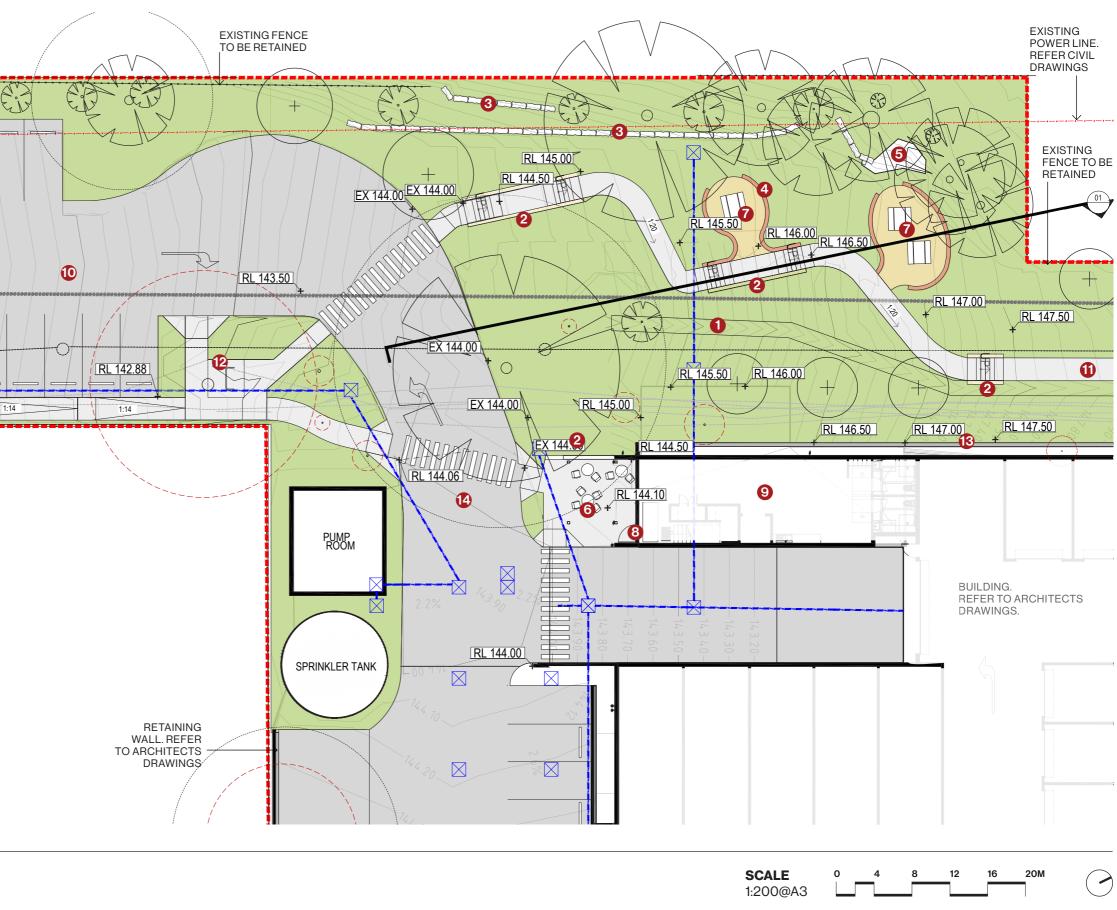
### DETAIL LANDSCAPE PLAN GROUND FLOOR
